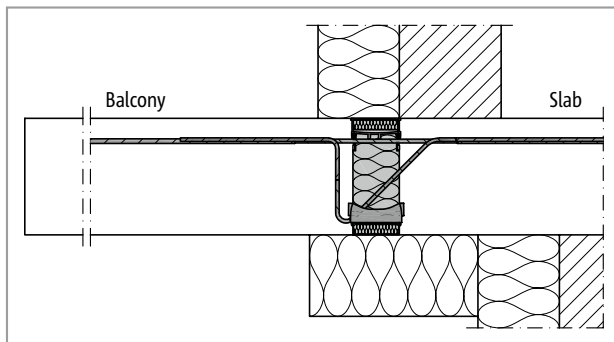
Schöck Isokorb® T type K: Connection with indirectly positioned floor and TICS
